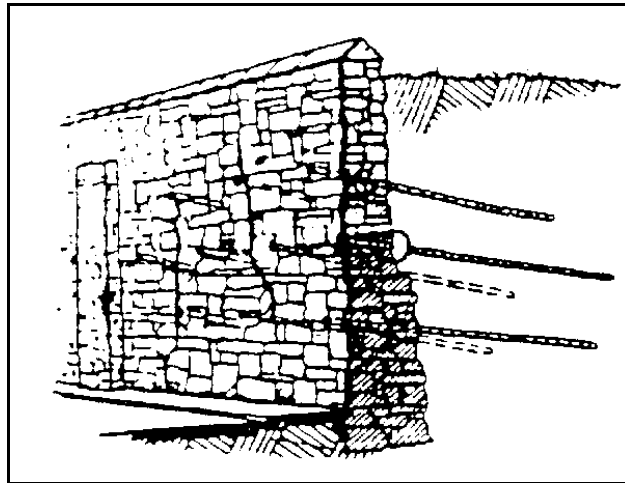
Stabilization of old masonry gravity walls using soil nailing (Schwing, 1990)
